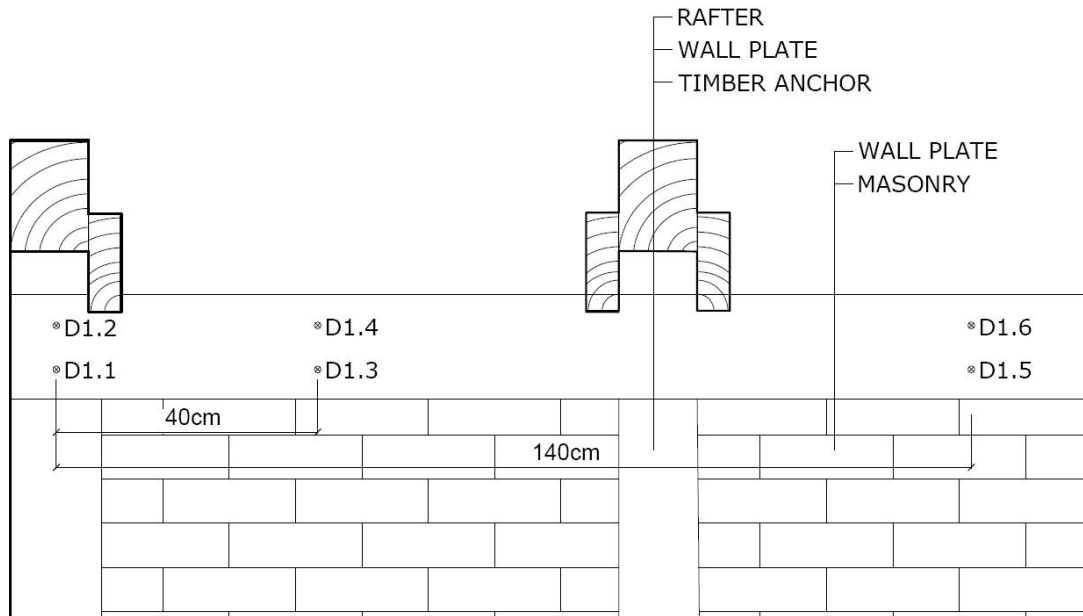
Detail D1 – Section longitudinal to the wall plate
